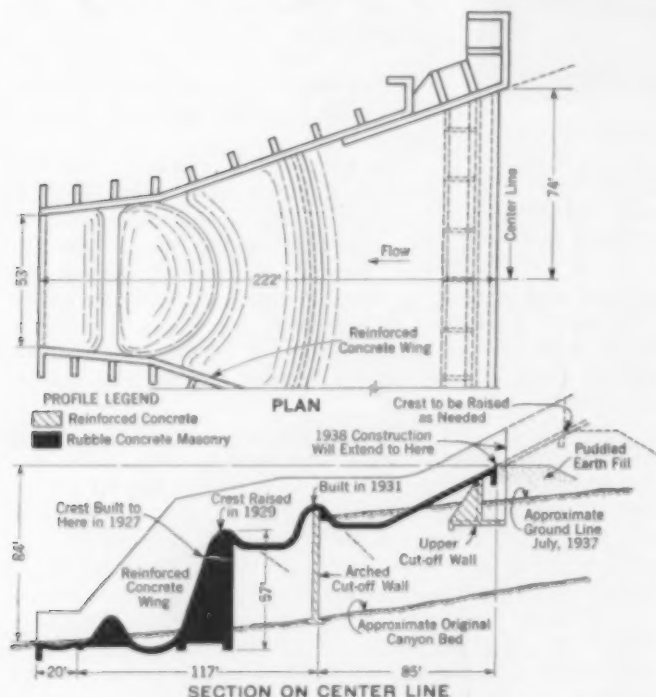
PLAN AND SECTIONAL ELEVATION OF KESSLER CANYON FLOOD BARRIER
